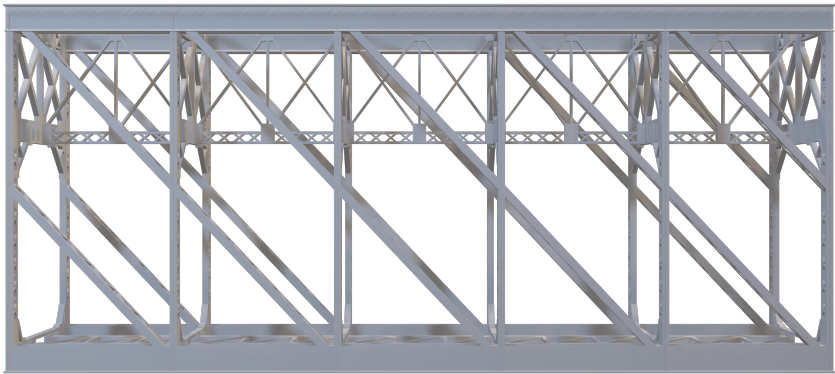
Bridge B8 – truss girder bridge with lower bridge deck.
